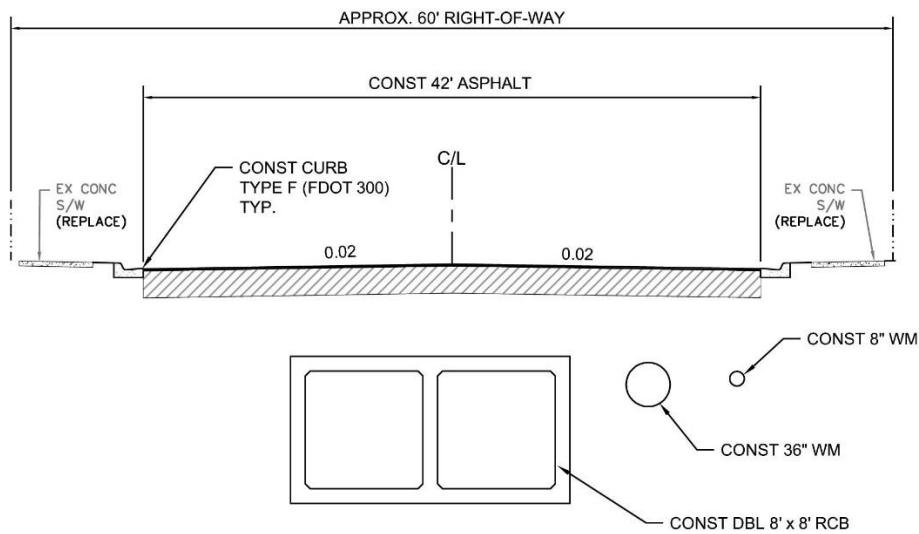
Cass Street West of Willow Avenue Typical Section (NTS)
